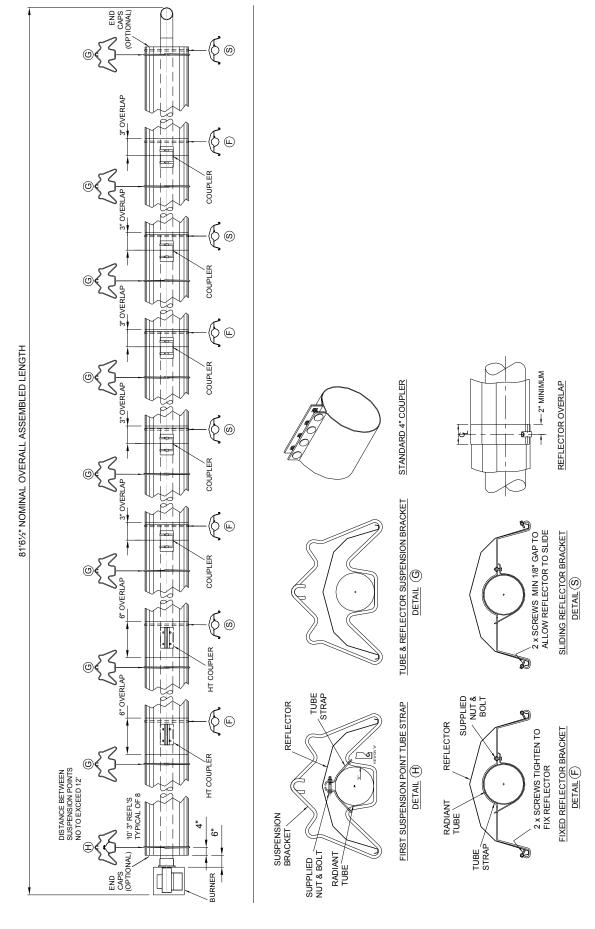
Heater Assembly: Model U tube 40-U20, 60-U20 and 80-U20.
